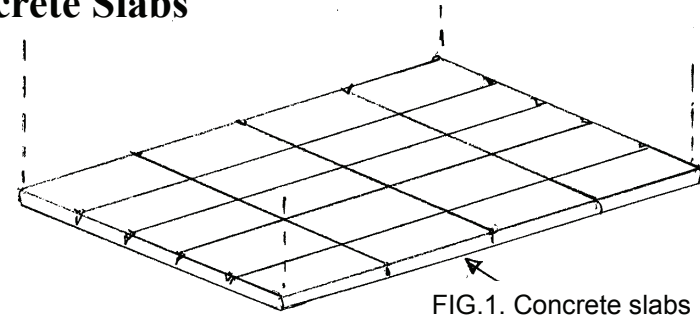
Concrete slabs preferably to same dimension as the building floor. Flat, level and square
